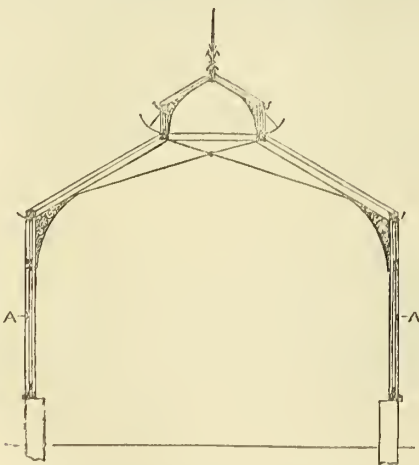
LARGE SPAN ROOF HOUSE. A A, CASEMENT LIGHTS.
